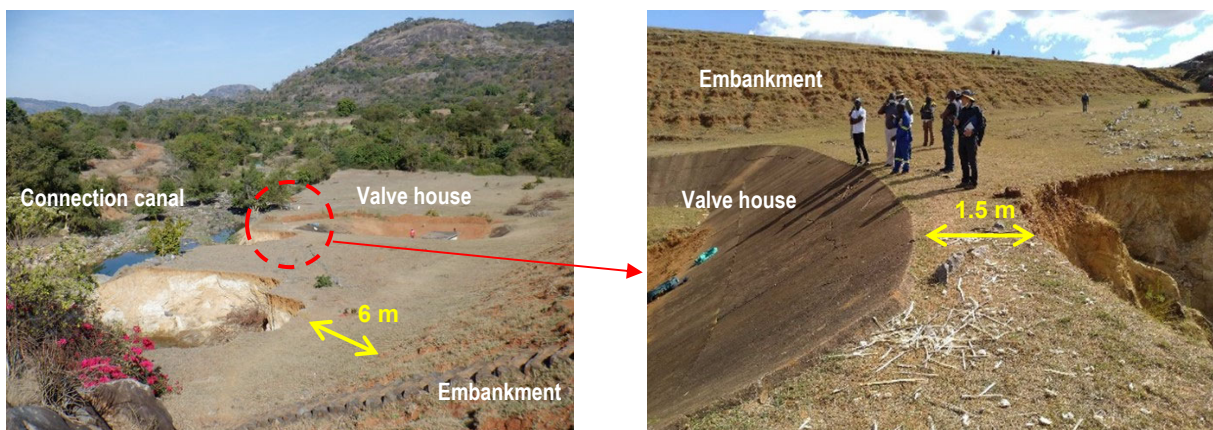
Collapses on the Right Bank Side (Embankment Side) Wall
